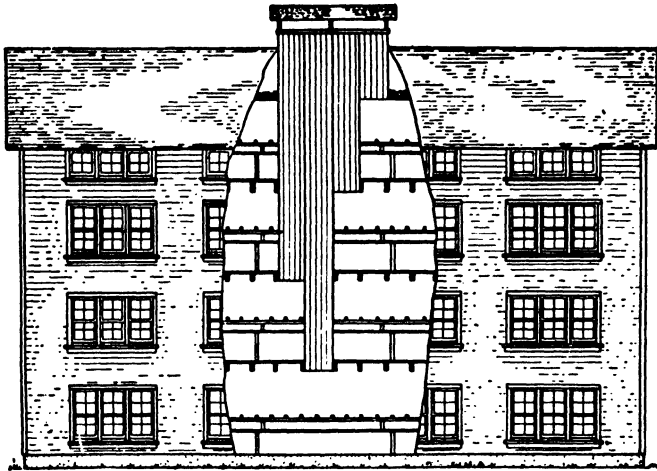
The ceiling outtake-flue system of ventilation for a cold or uninsulated walled house. Each floor has a separate flue. From Cornell Ext. Bul. 315.
